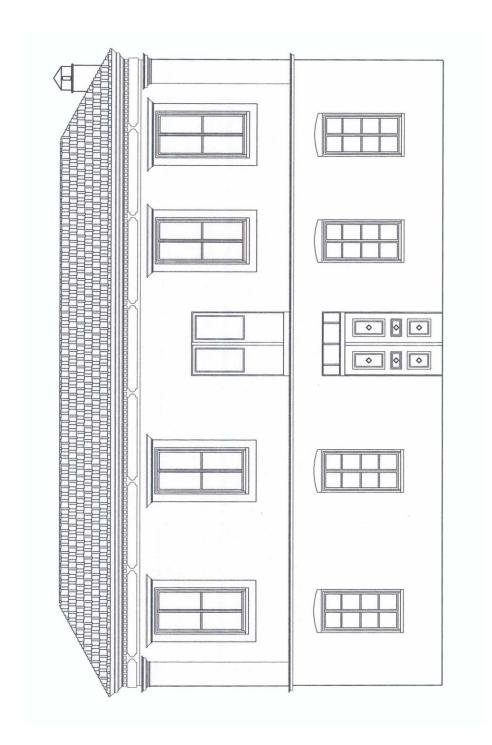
Front Elevation of 19-Hamam Street Scale: 1/75
